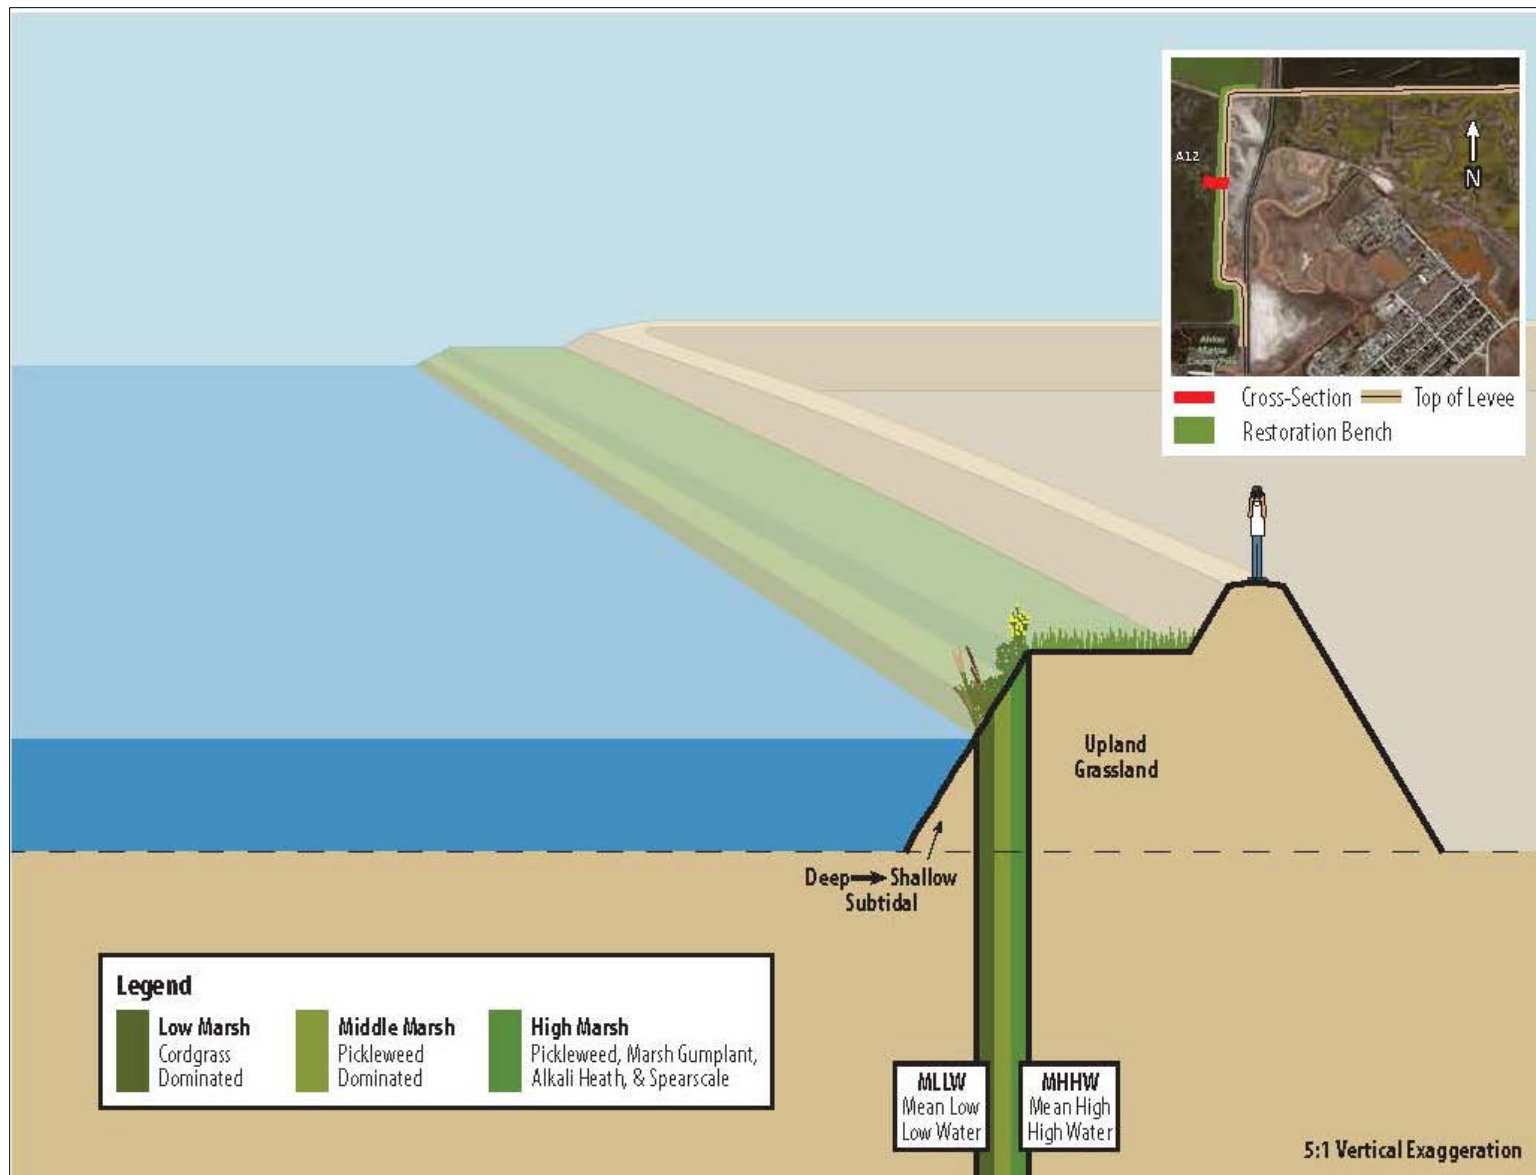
Pond A12 Proposed Bench Option Cross-Section
